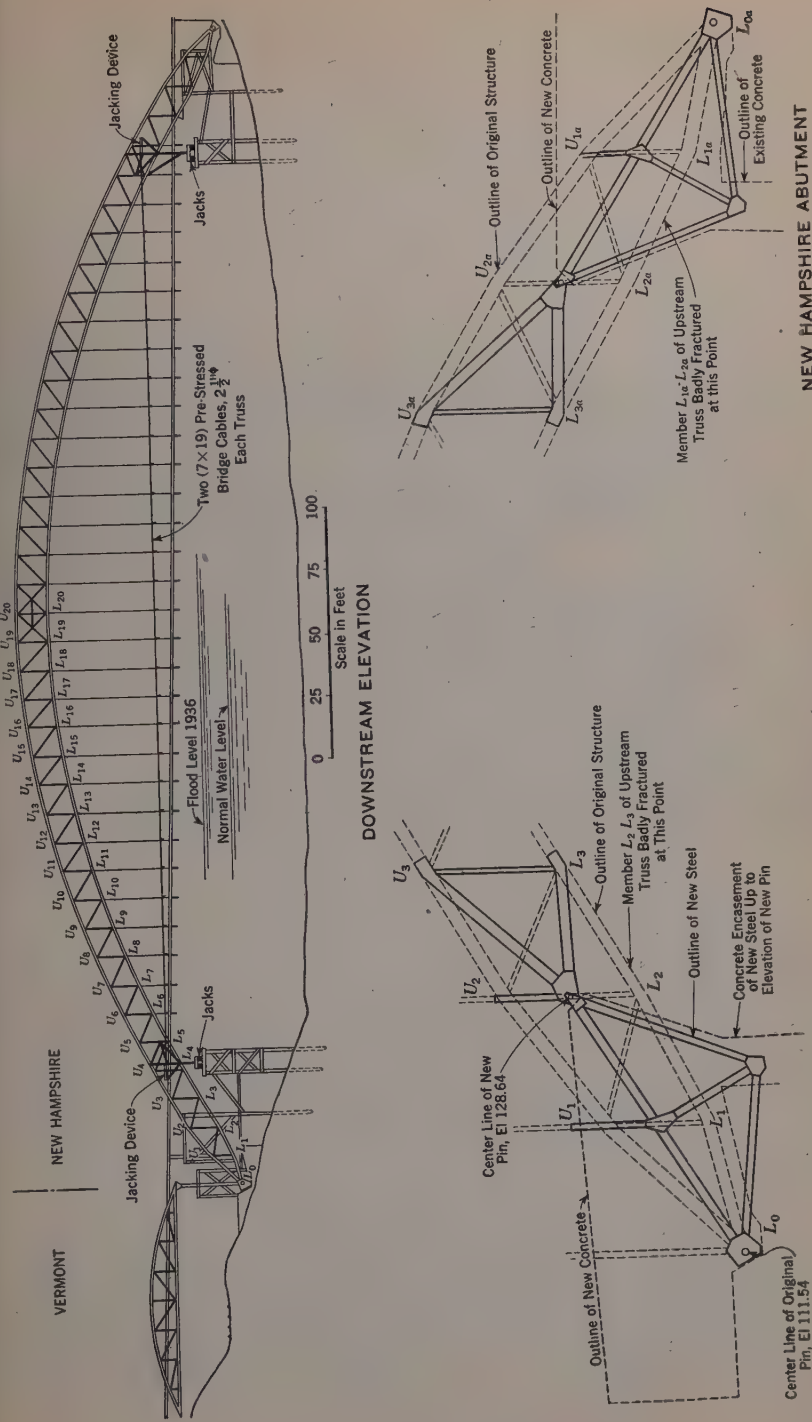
ADOPTED PLAN OF FALSEWORK FOR ALTERATIONS AND REPAIRS
